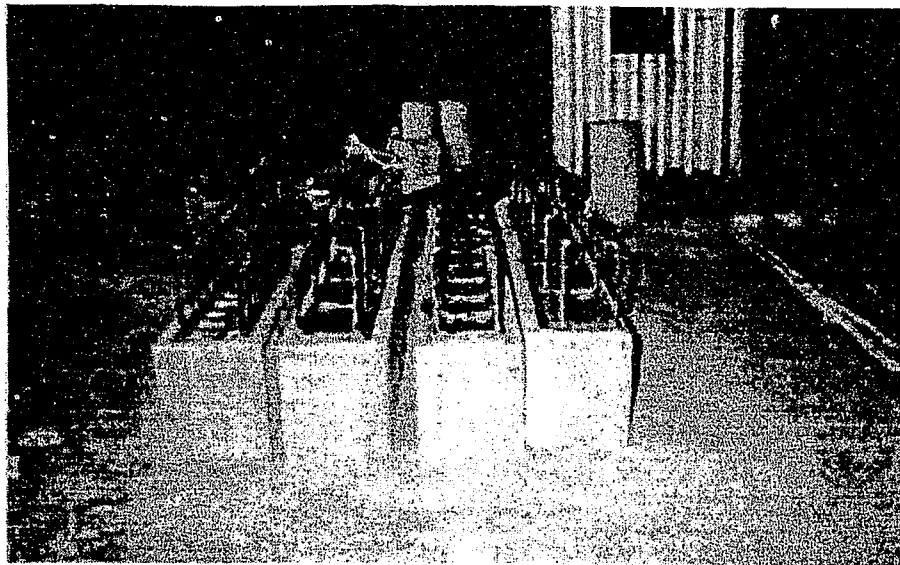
Assembly of test specimens during casting (Hossain 2001)
